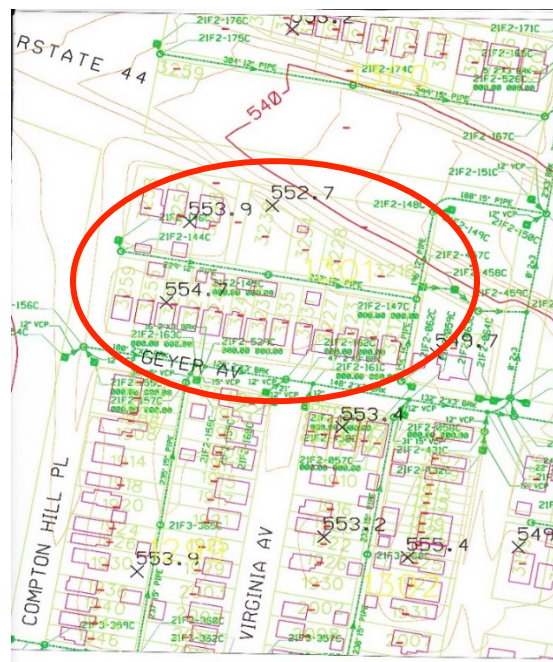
Permeable Interlocking Concrete Block Pavement at Geyer Ave.
